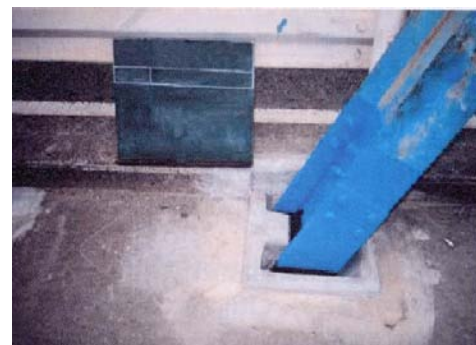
Brokenness of flange in a diagonal member in a truss bridge¹⁾
